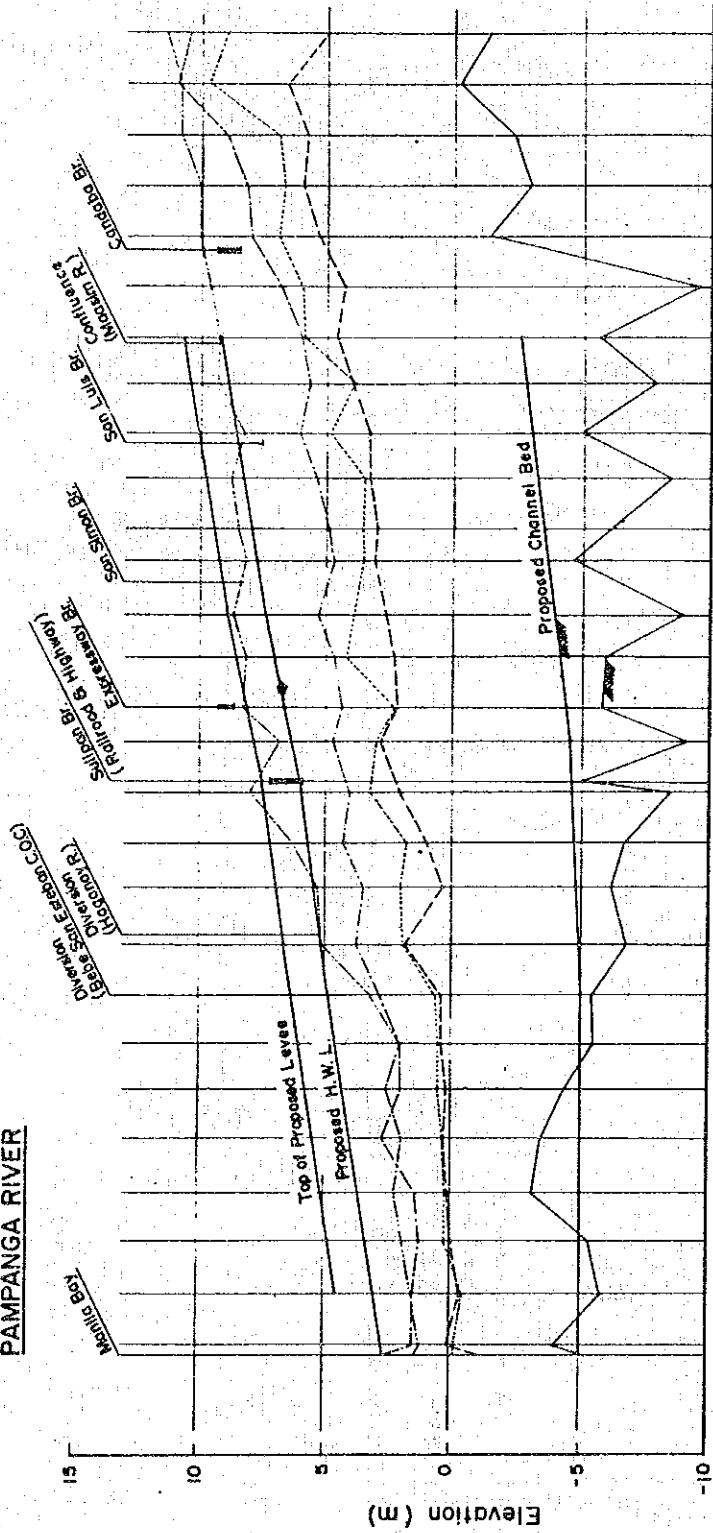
(1) PROPOSED LONGITUDINAL PROFILE FOR BASIC PLAN
